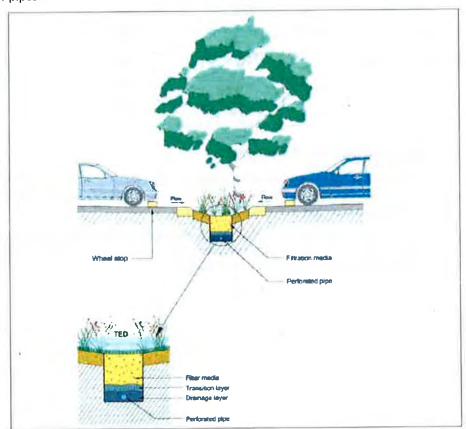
Typical car park rain garden setup (WSUD Engineering Procedures: Stormwater)
